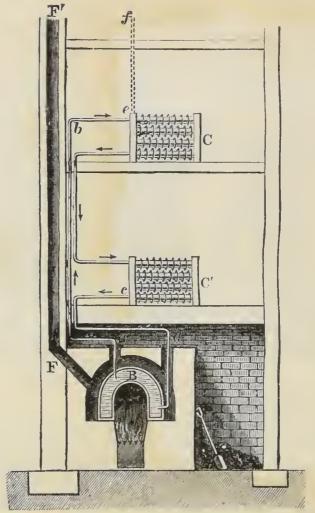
Arrangement of pipes for heating a building with hot water.
